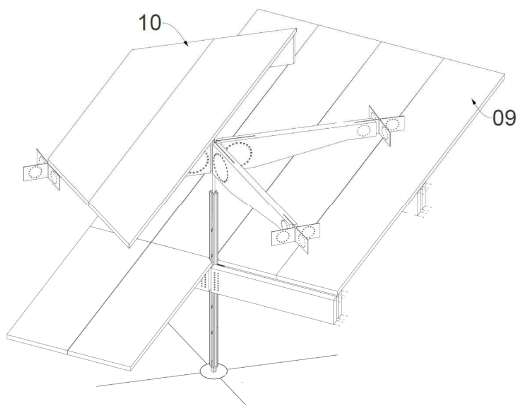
Secondary structural elements (Image copyright: Edward Cullinan Architects) 9. Cross-laminated floor panels: 226mm thick; 10. Cross-laminated roof panels: 146mm thick
